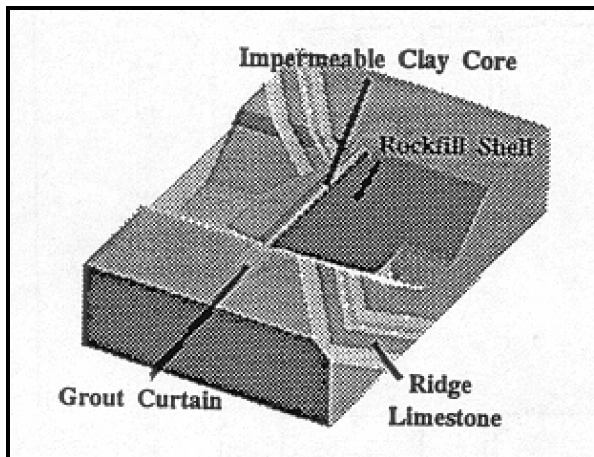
Simplified 3-D model dam, grout curtain, and Ridge Limestone
